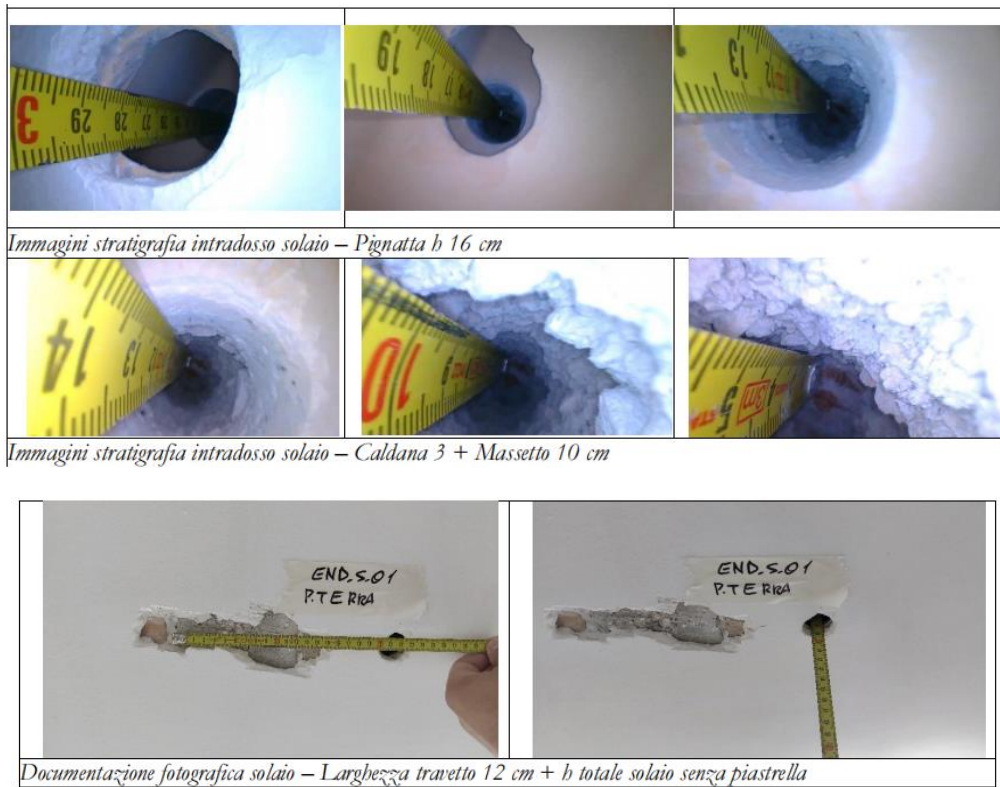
layers measurement\_Ground Floor ceiling (END\_S\_01)
